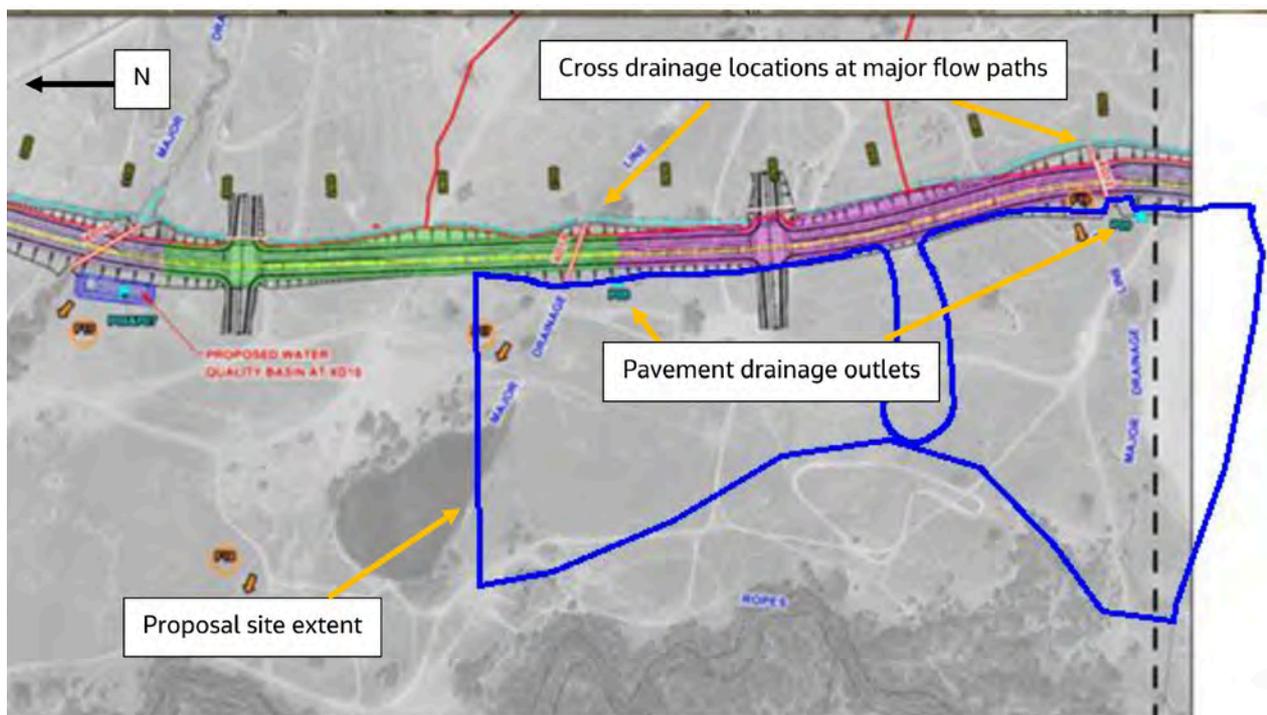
Excerpt of concept drainage strategy from *Archbold Road Flooding and Drainage* (Lyll & Associates, 2016)
